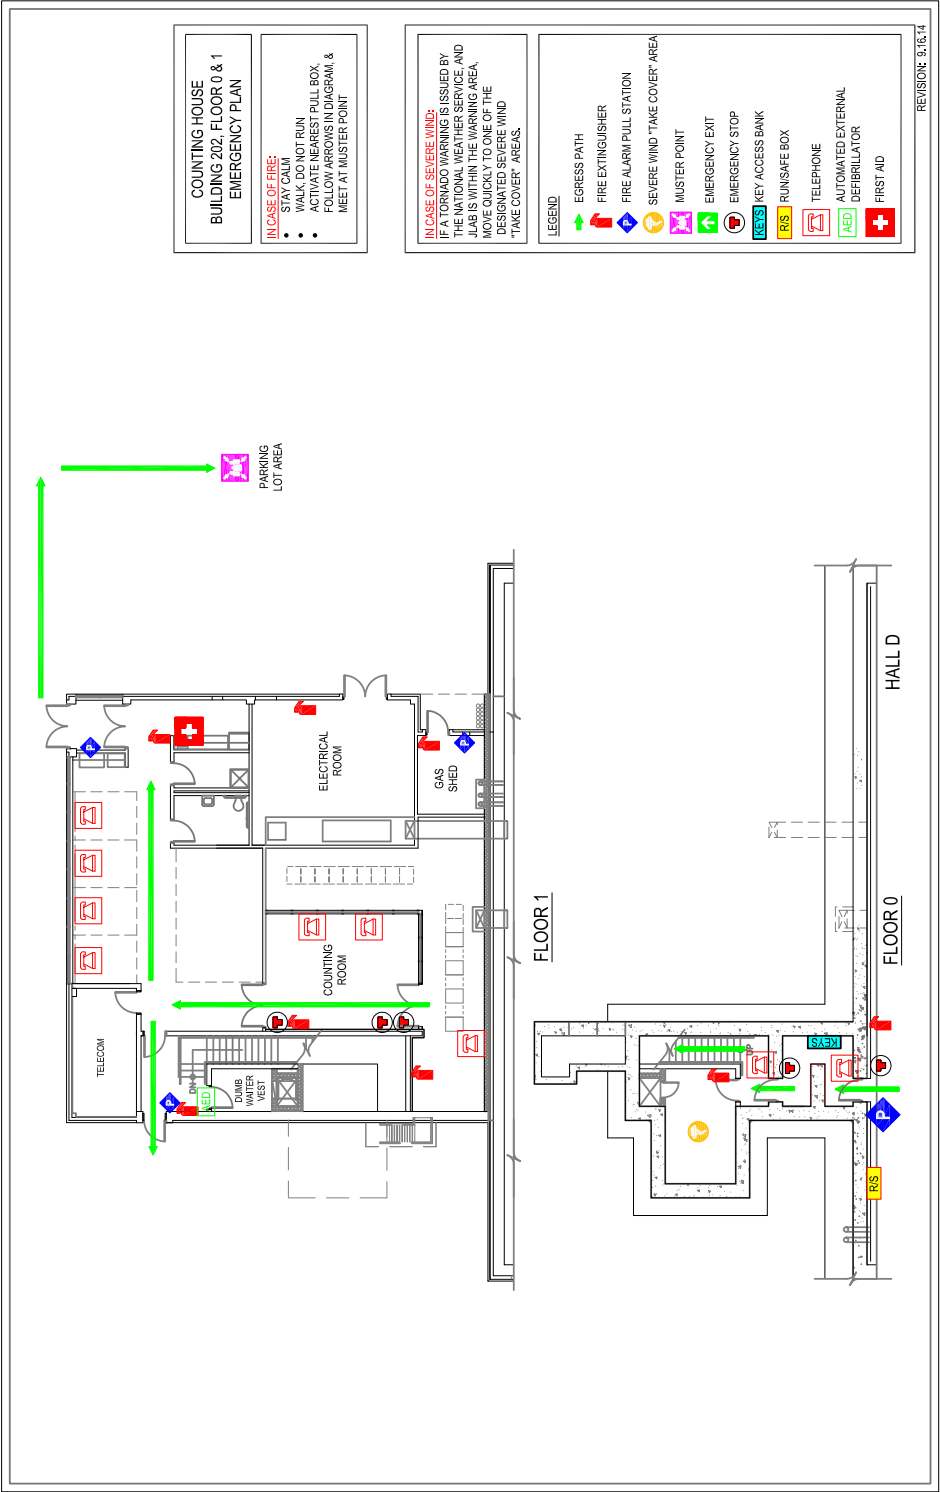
Layout of the Hall D experimental hall indicating safety equipment and emergency plan.
